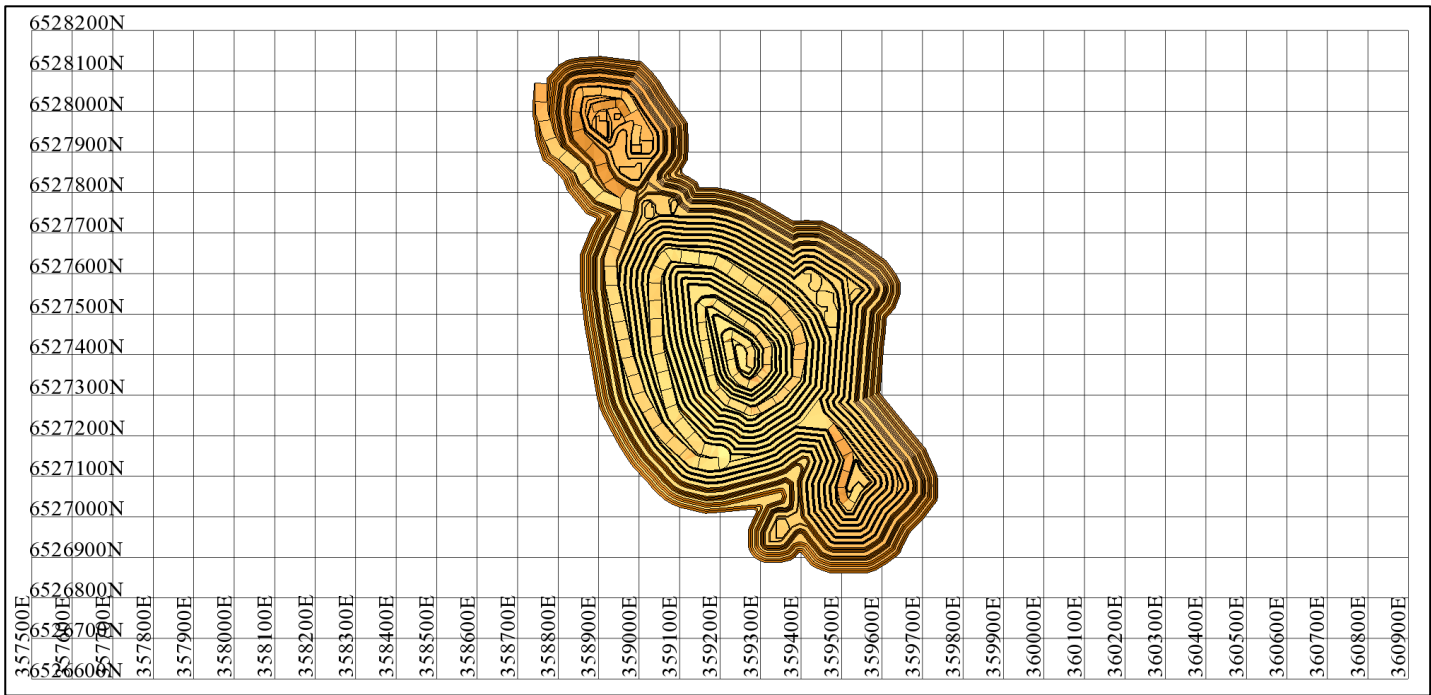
Theia stage 2 pit design – Plan view - Reserve Case
